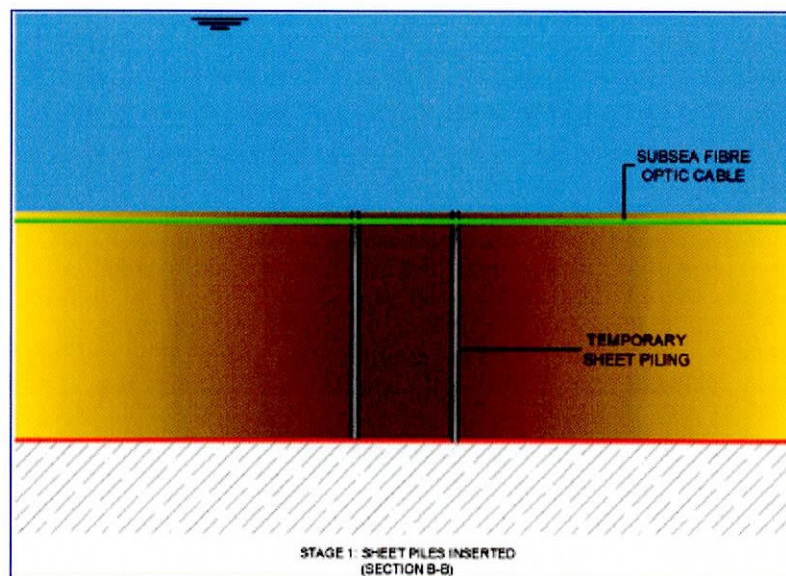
Fibre Optic Cable Crossing – Stage 1 – Install Sheet Piles
